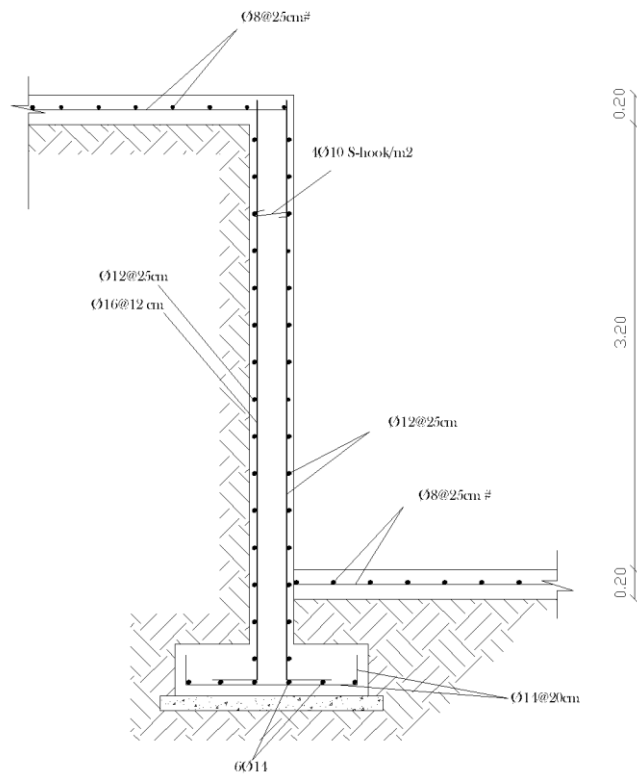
Reinforcement Detail of Basement Wall ( BW1 )
